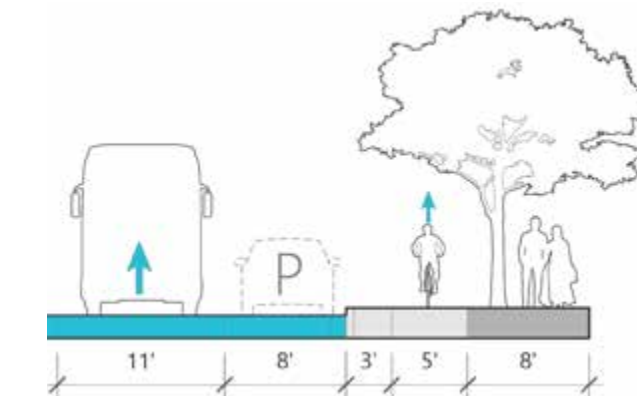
Bus on a Typical Arterial Street with a One-Way, In-Street Class IV Bikeway.
